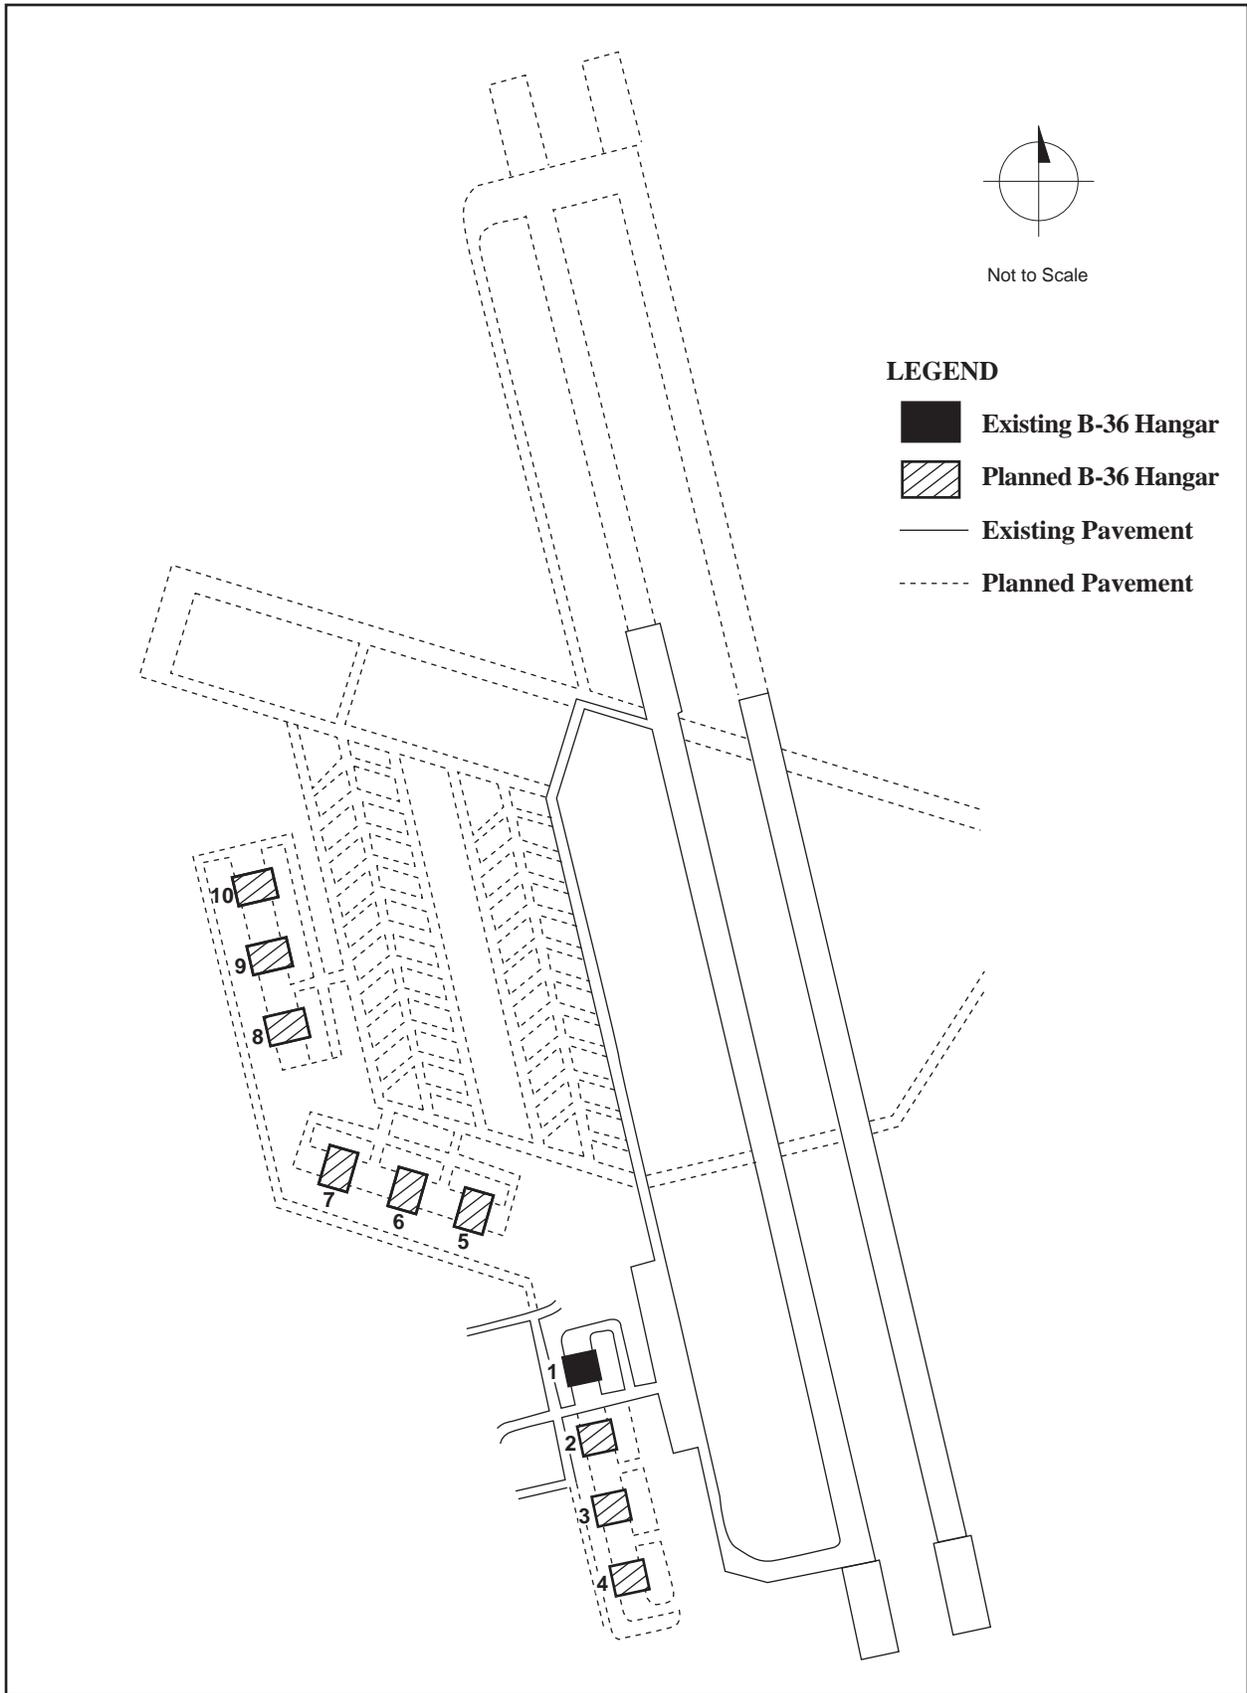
Layout plan for 10 B-36 hangars, Loring [Limestone] Air Force Base. May 1948. Adapted from the original plan held at the National Archives II, Maryland.
